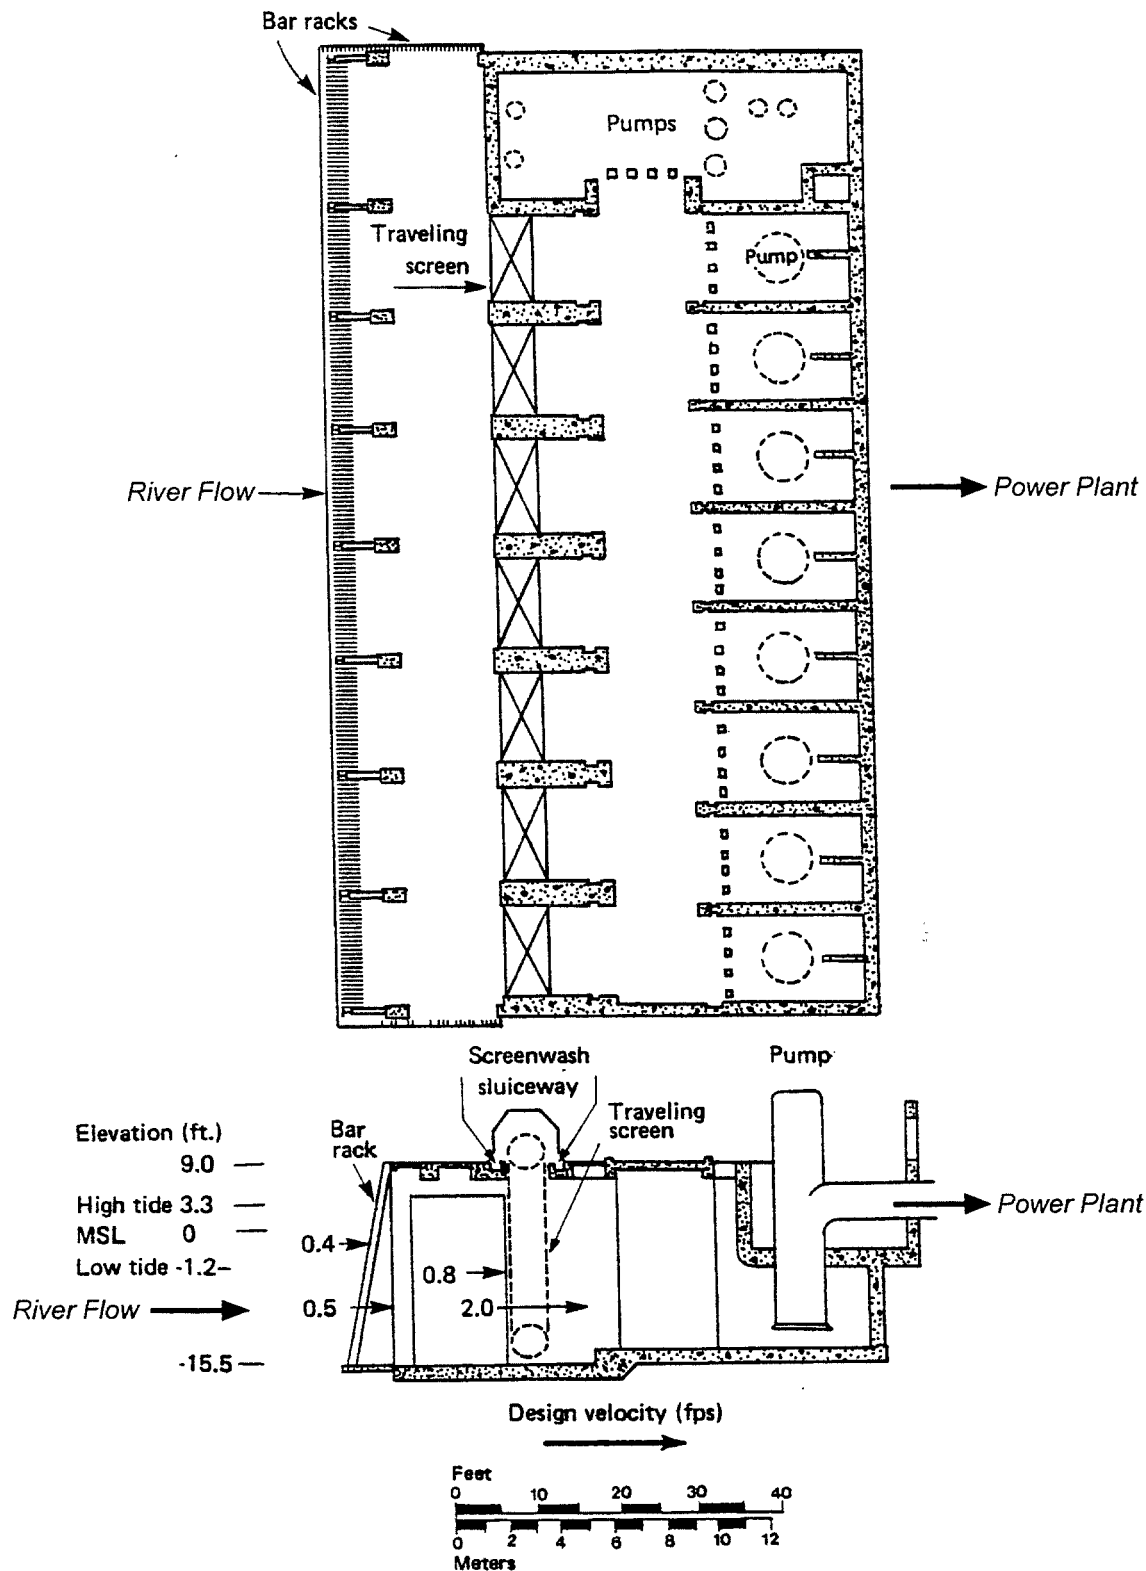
Plan and section schematic diagrams of Pittsburg Power Plant Units 1-4 intake structure.
